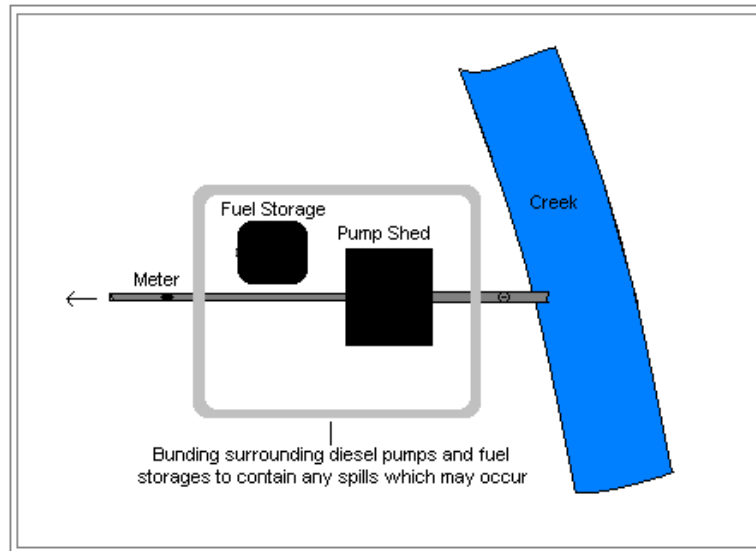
Birds eye view of the 'right' way a waterway off-take should be installed
